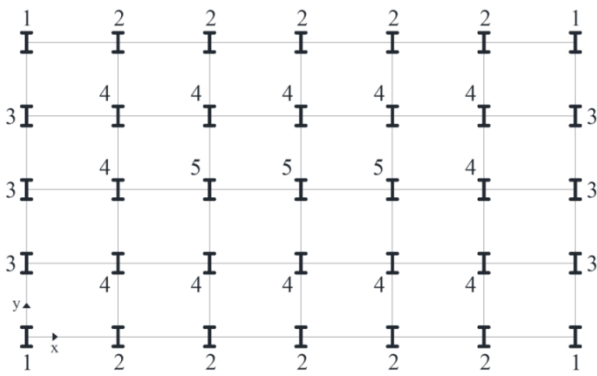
Columns grouping of 1026-member steel frame in plan level
